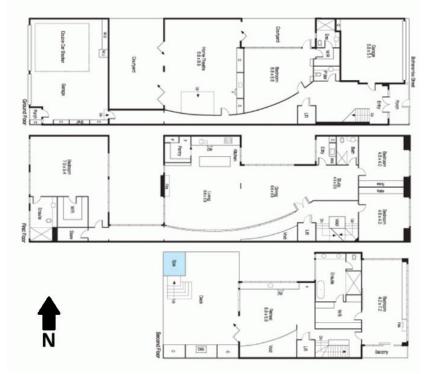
Floor plan of the adjoining dwelling at No. 23 Wangaratta Street (Source: https://www.realestate.com.au/property/23-wangaratta-st-richmond-vic-3121)
